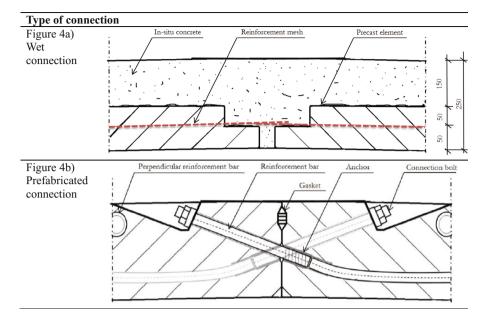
Cross-sections of (a) wet connection and (b) the fully precast solution.
